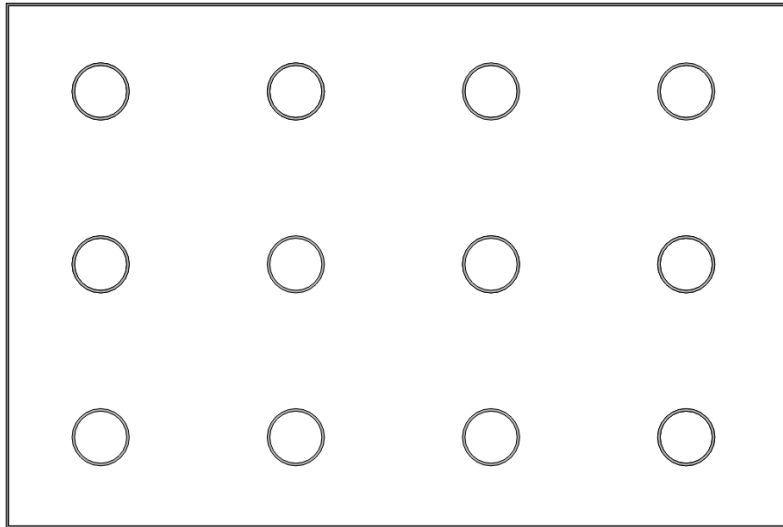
Cross Section of Pipes Running Parallel to the Air Duct
